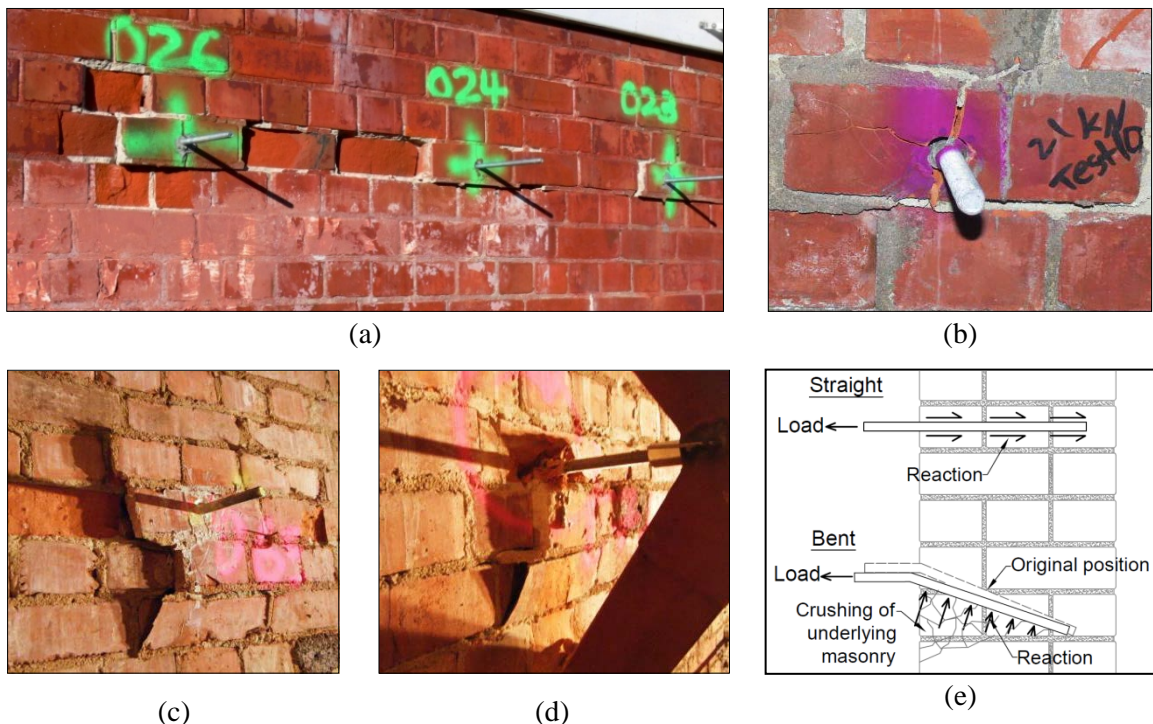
Typical failure modes: a) Typical masonry pull-out type failure observed; b) Localised splitting of brick; c) Straight anchors; d) Bent anchors; e) Schematic view of observed failure modes.
